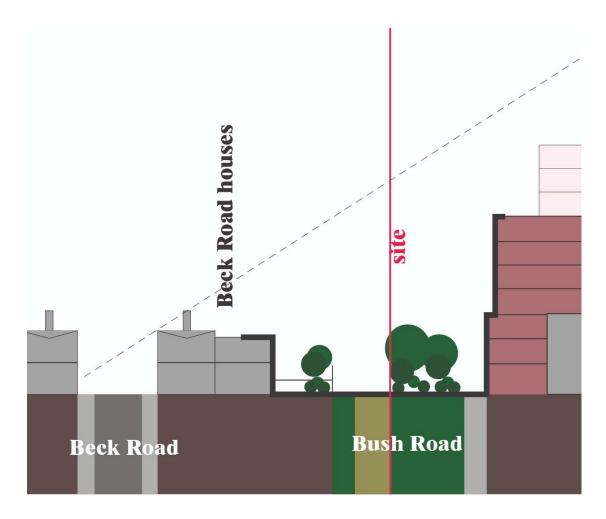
Fig X: section diagram showing an example of a Bush Road as a Local street (urban neighbourhood) and the relationship of street width to height of the buildings that enclose it<sup>49</sup>
